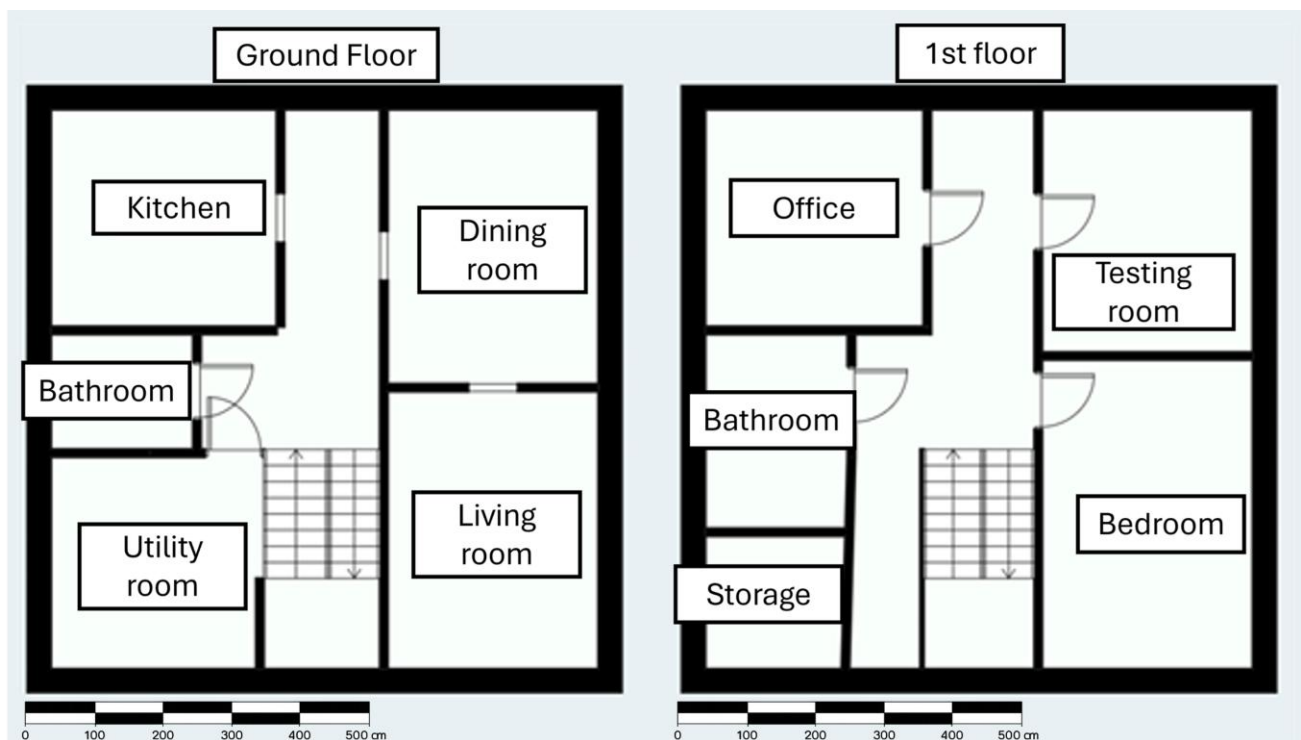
Study site: 2D plan of the house showing the ground floor layout and the location of the test room, which is situated on the first floor.
